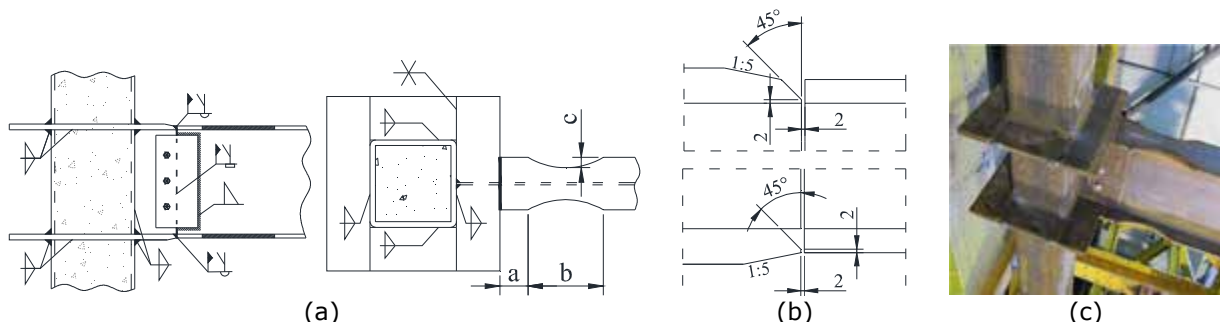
RBS joint: a) configuration, b) preparation details, c) specimen illustration
